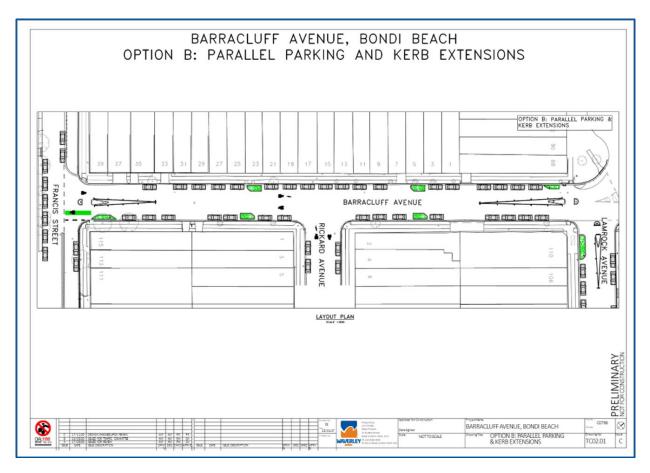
Option B – Original pedestrian refuge island design with kerb extensions and parallel parking.
